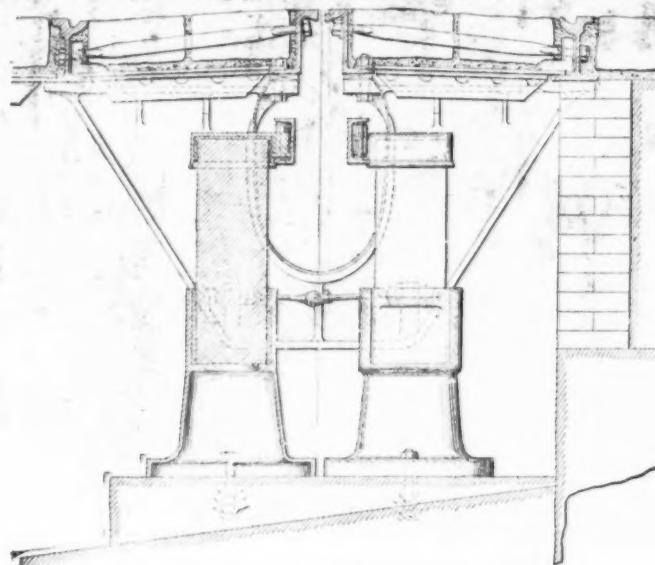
SECTION OF CONDUIT—PEDESTAL SUPPORT.
